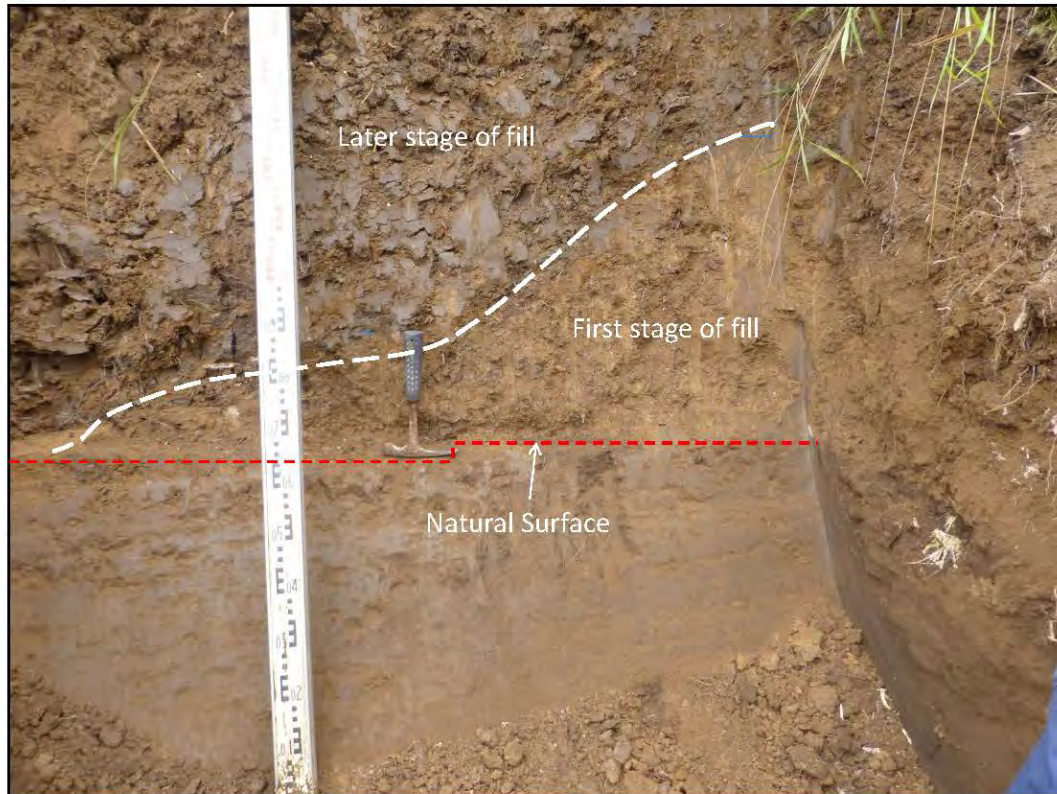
Test Pit 113 – Western side of access track – viewed towards south
